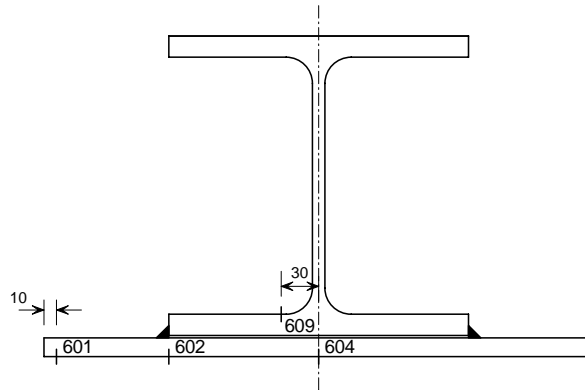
Internal beam transverse arrangement of thermocouples at position C
